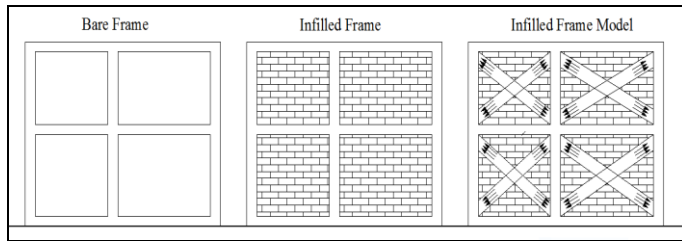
Structural layout of bare frame, infilled frame and infill frame models
